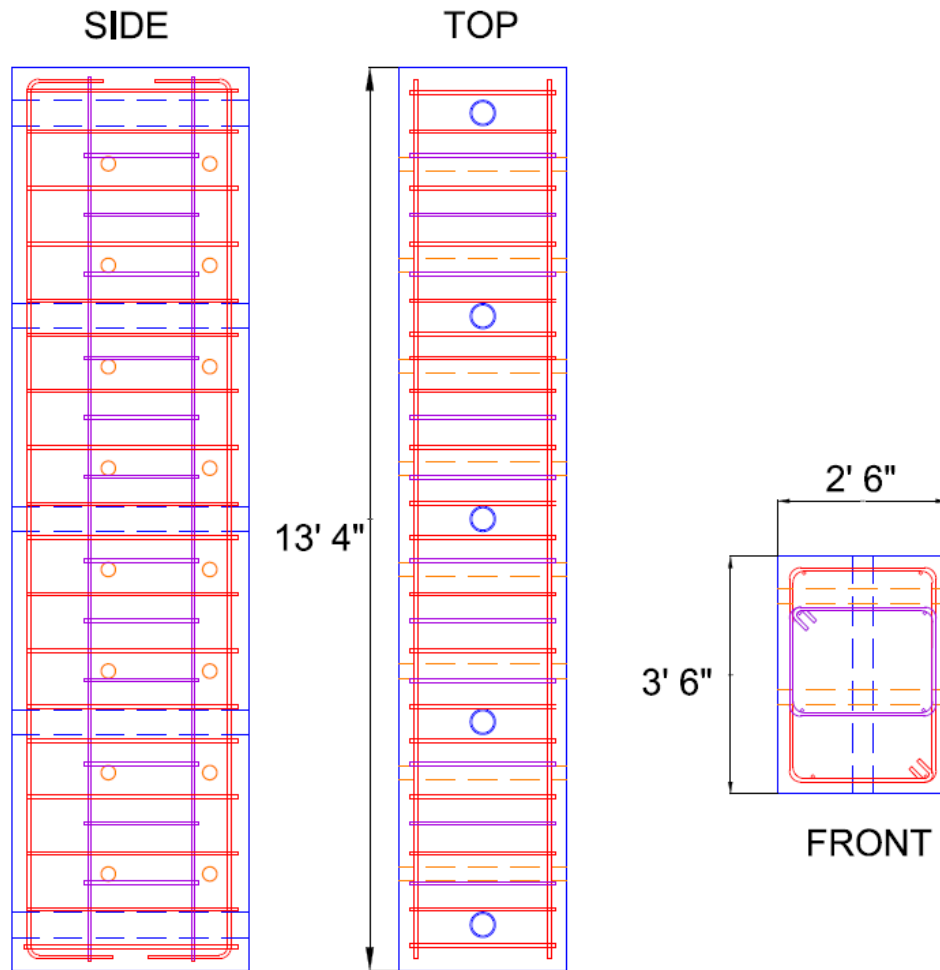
Dimensions and rebar layout for column anchorage block.
